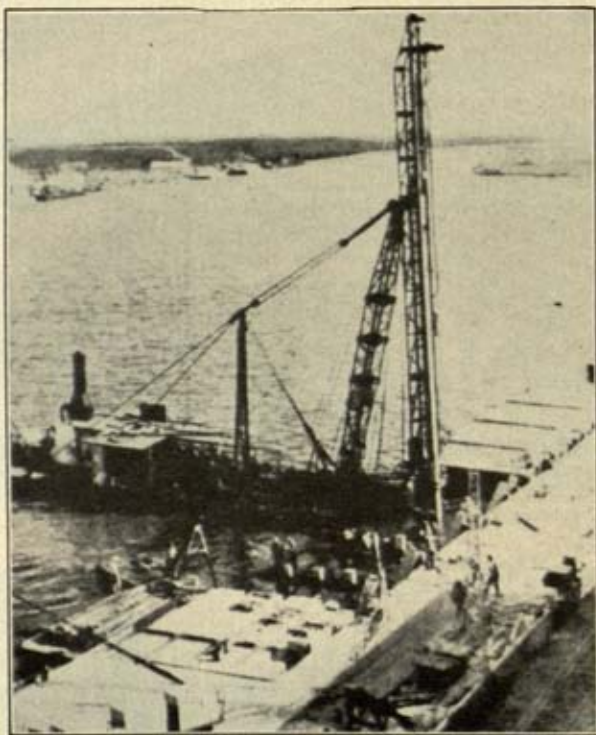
Barge-mounted rig driving precast concrete piles. (*Raymond Concrete Pile Co.*)
